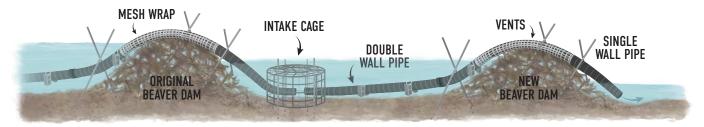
Pond leveler extension to accommodate additional downstream beaver dams.
